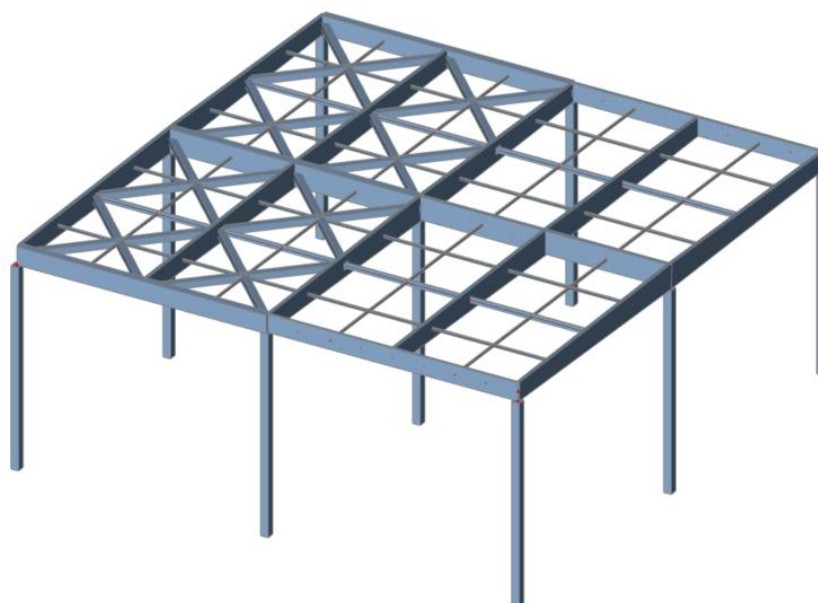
3D-view of a part of the roof beams, bracings, lateral supports, and columns (own illustration, made with SCIA Engineer)
